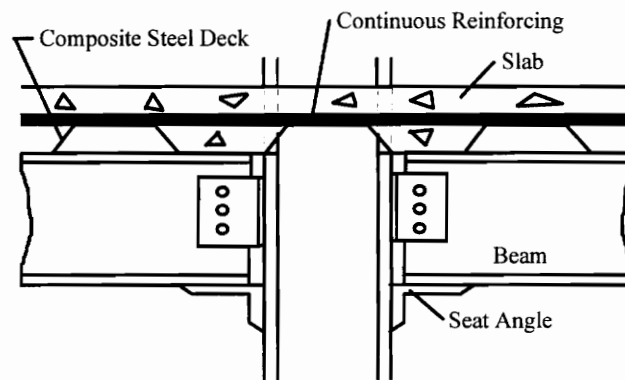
Typical Semi-Rigid Beam-to-Column Connection
